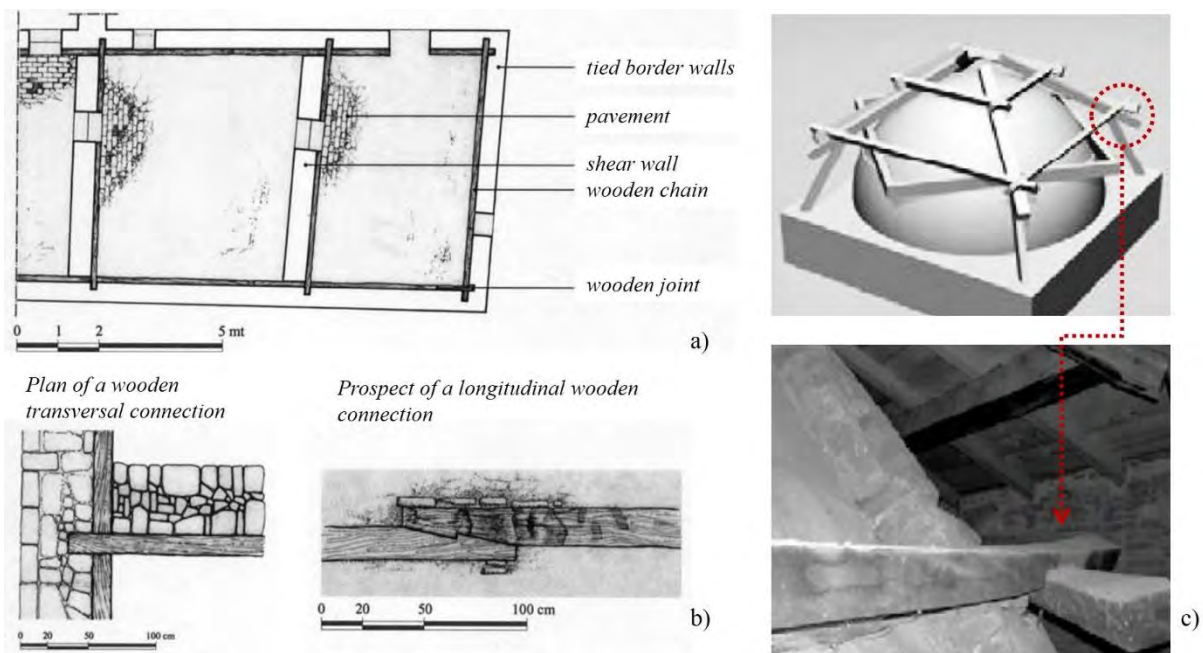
Tie beams: a) historical masonry building in Guardiagrele (Chieti) with improving connection between the walls (survey by E. Candigliota and published in [12], p. 16, modified by the authors); b) two details of transversal and longitudinal connections; c) the extrados of a dome in Penne with the layout of the timbering system realized for containing the lateral forces, with a picture (source in [13], p. 62, modified by the authors).
